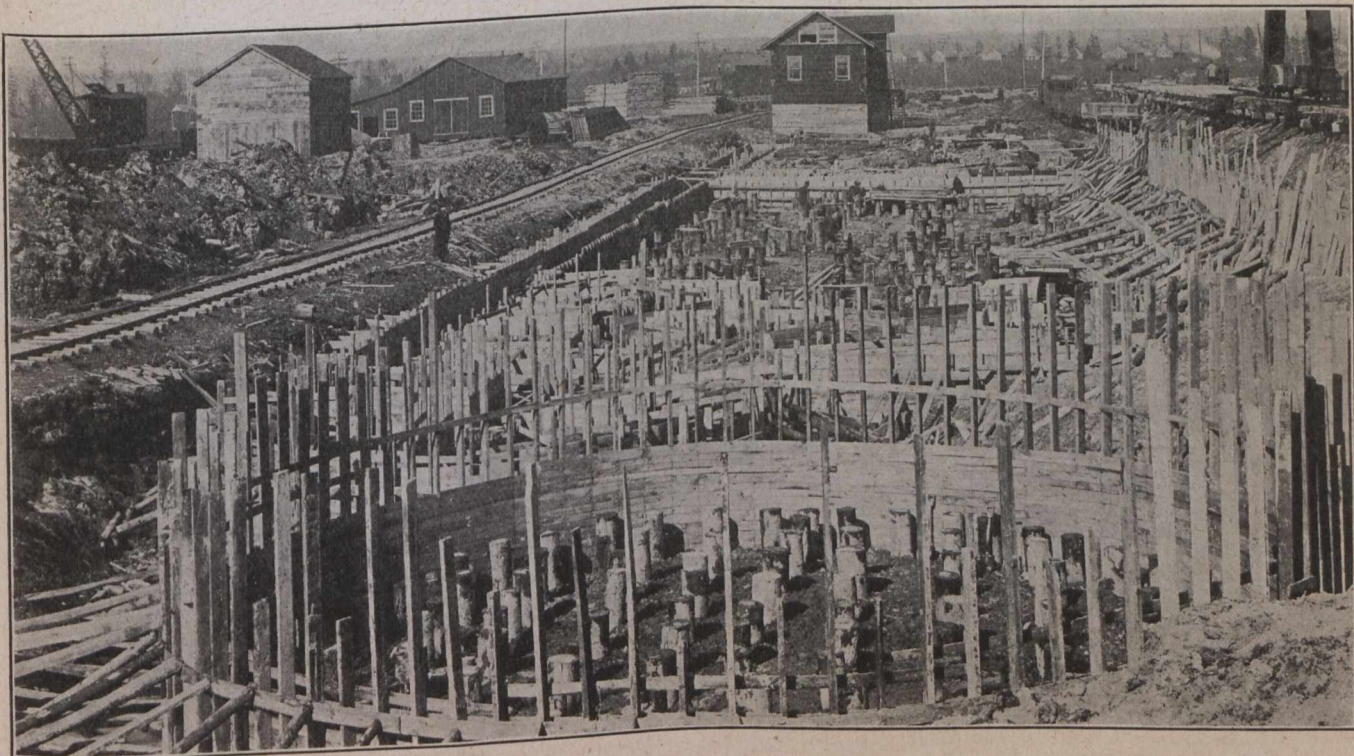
Progress of Piling and Form Work in 19 Working Days, or up to May 19.
